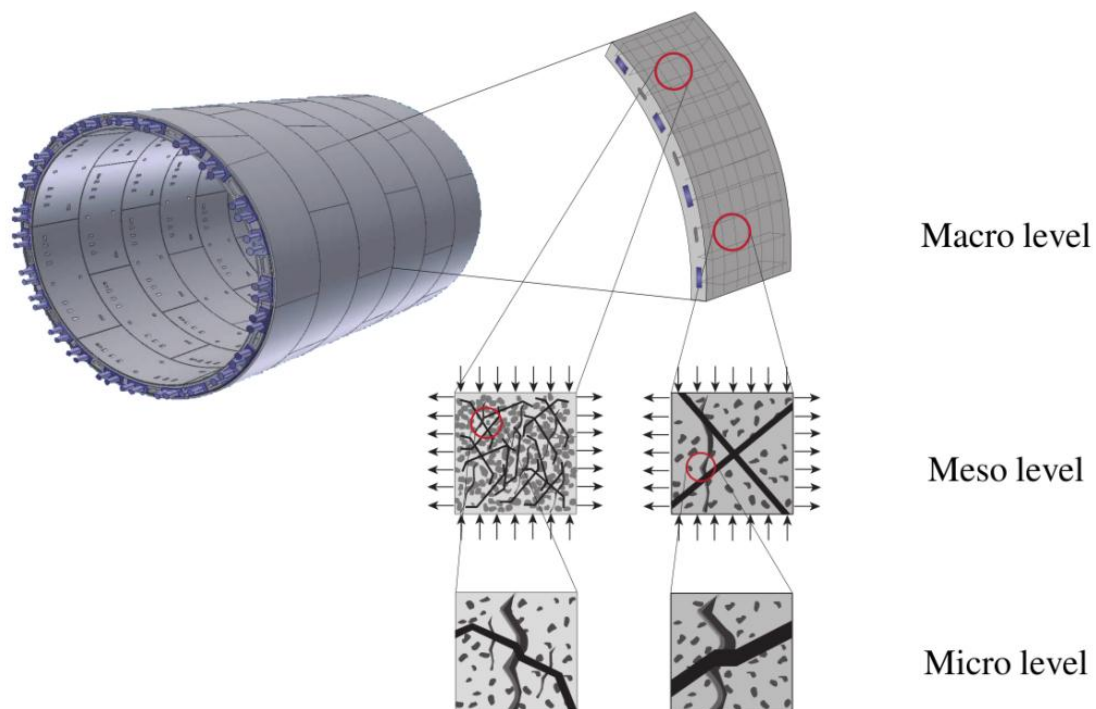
Multiscale modeling concept of segmental tunnel linings made of steel fiber reinforced concrete.
